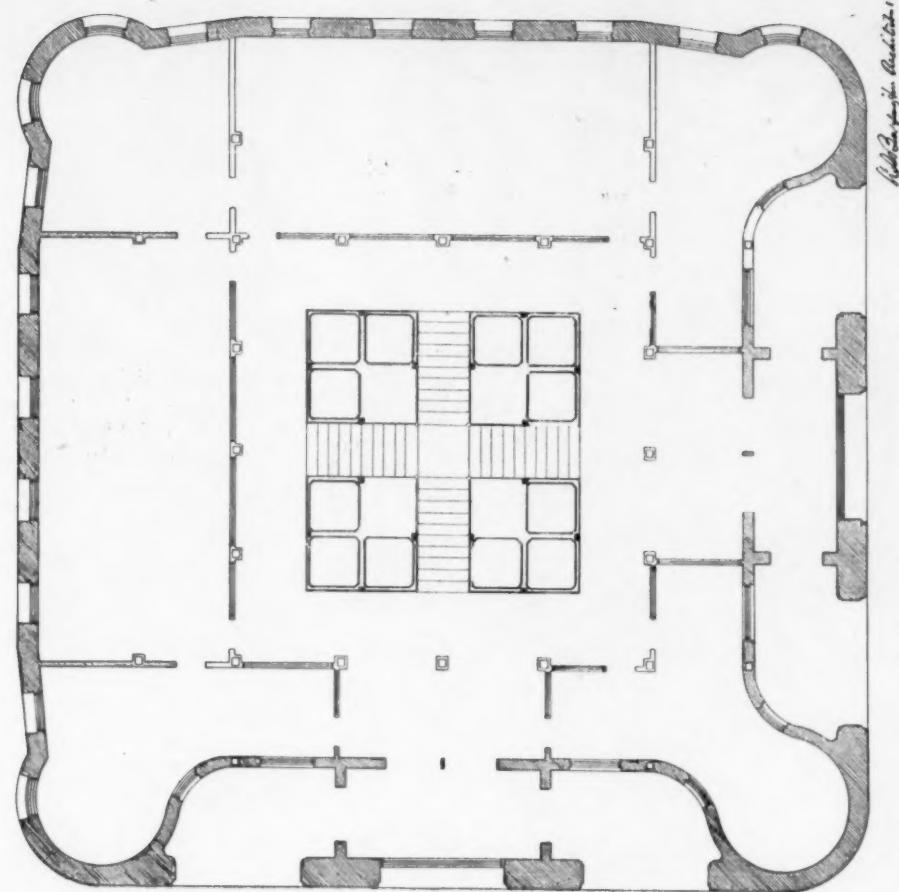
Plan of Ground Floor for Twenty-Eight-Story Building, by L. S. Buffington
